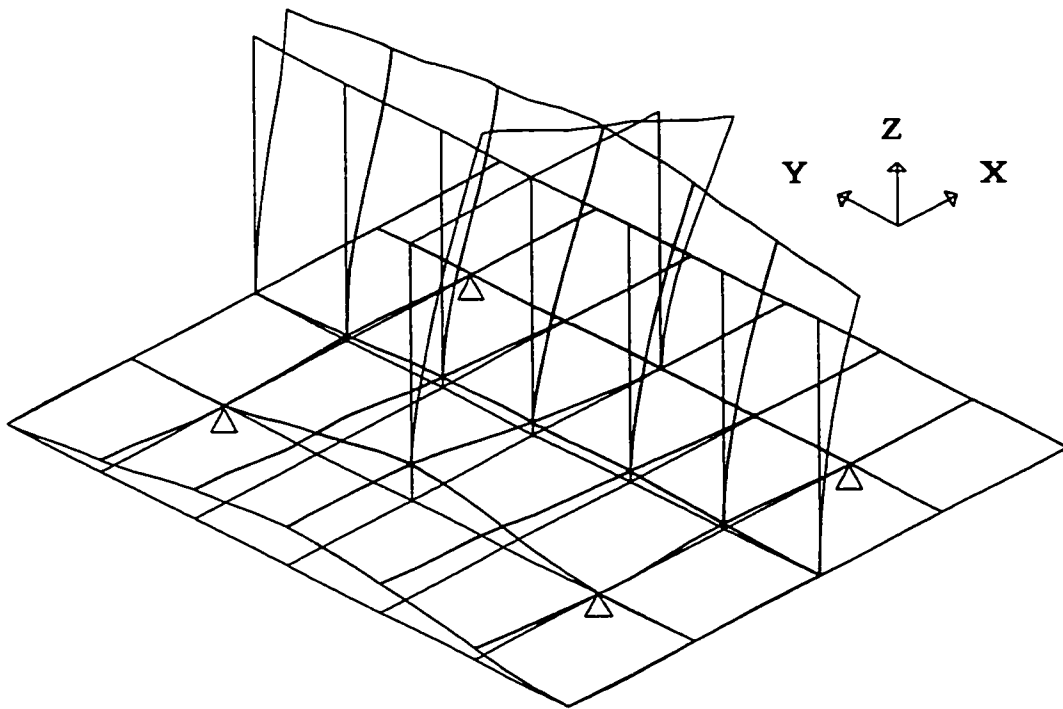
Flexibility of the girder's bottom flange in modeling the level of fixity, based on SAP90 analyses (the rest of girders and web stiffeners not shown).
